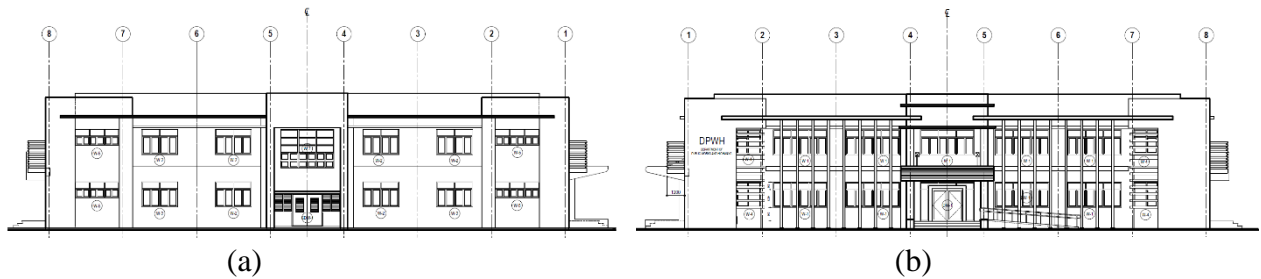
Rear (a) and Front Elevation (b) of the Target Building.
